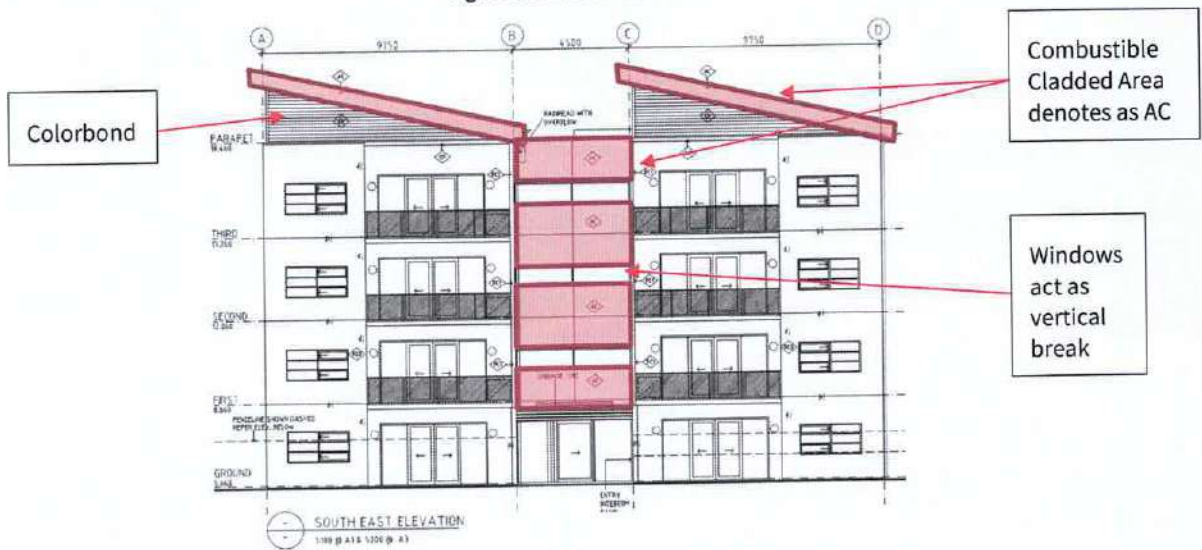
South East Elevation ACP Panel (Main Entrance Façade)
